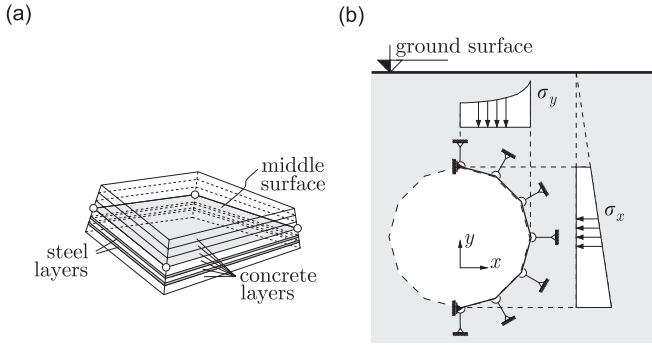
Illustration of (a) layered finite beam element (containing concrete and steel layers) and (b) beam-spring model [1].
